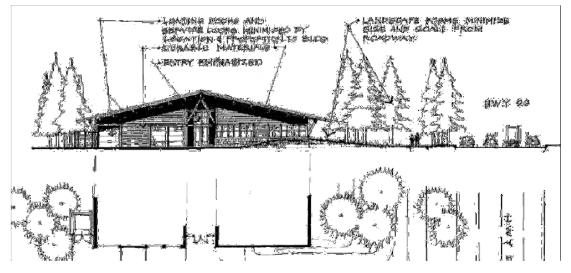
J: Landscape Management Area Detail – Plantings with Planned Openings (Example)
